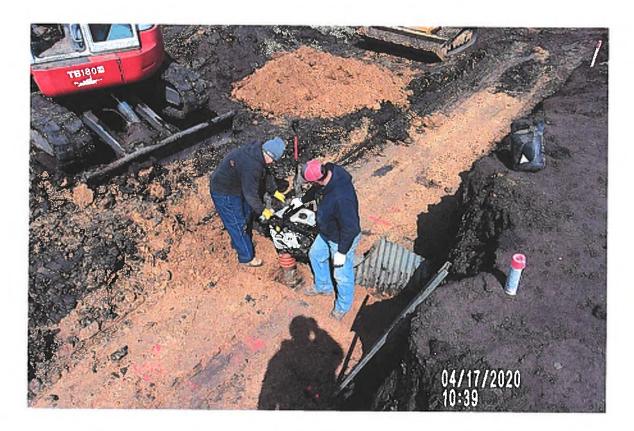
PLATE COMPACTING BACKFILL SOIL AROUND METAL ANTISEEP COLLAR BEFORE SURFACE DRAIN INSTALLED.
